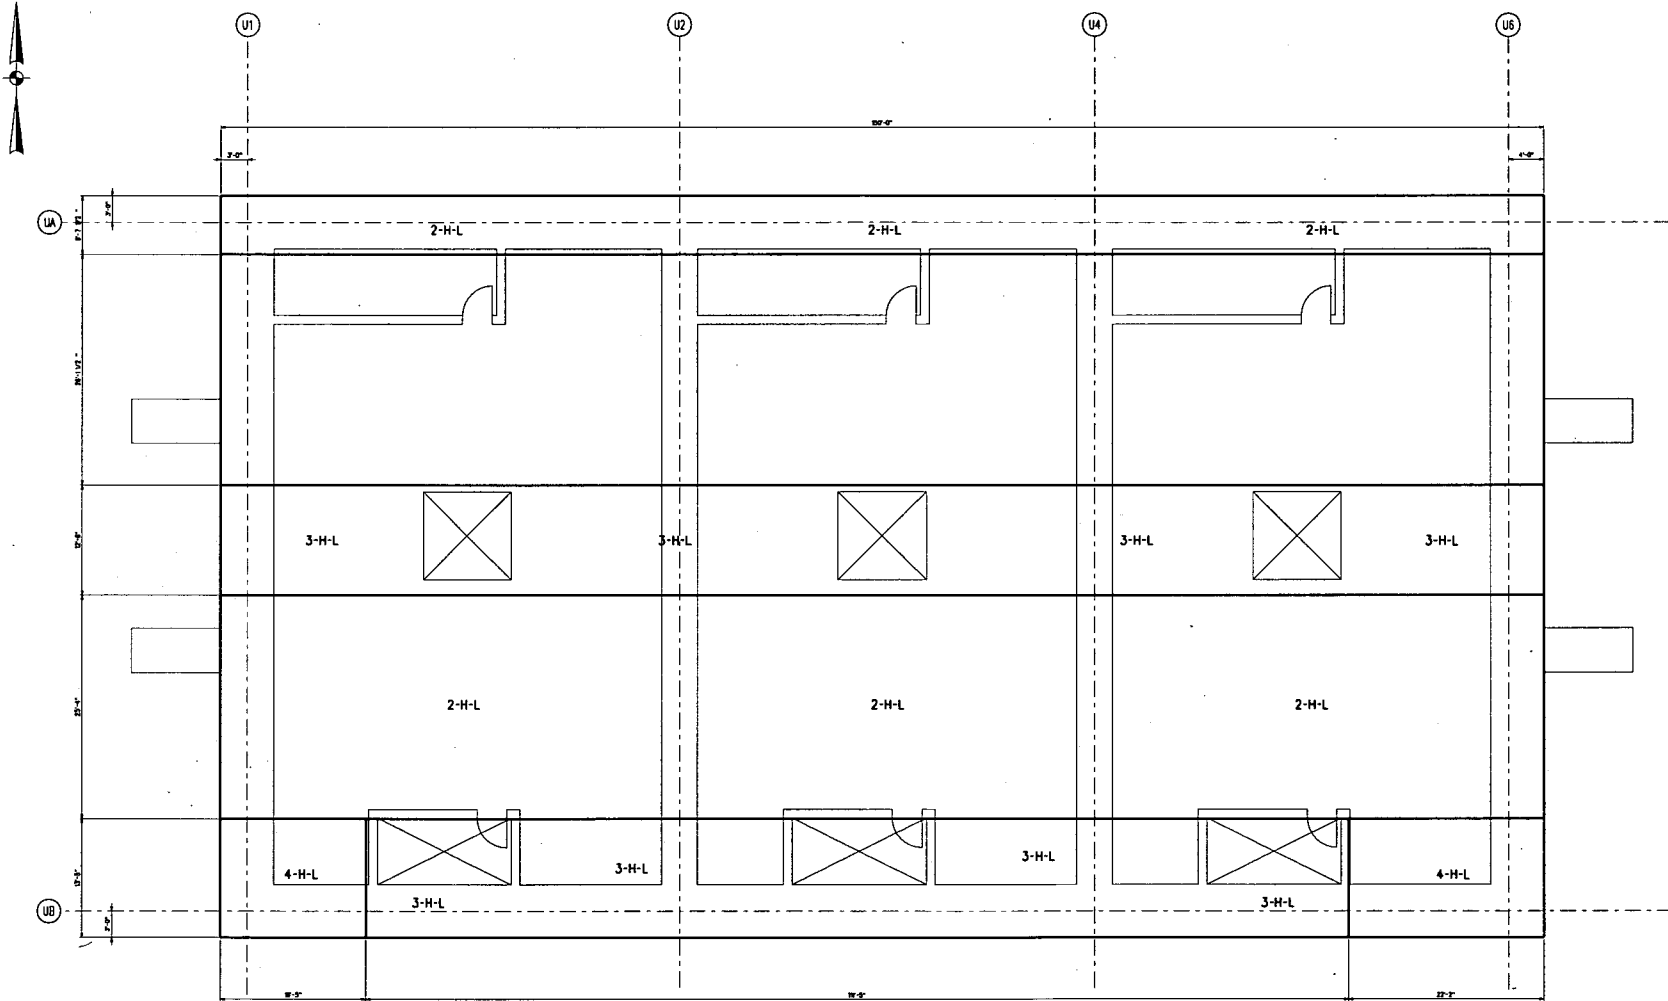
H.6-127: PUMPHOUSE FLOOR EL. 14'-0"
